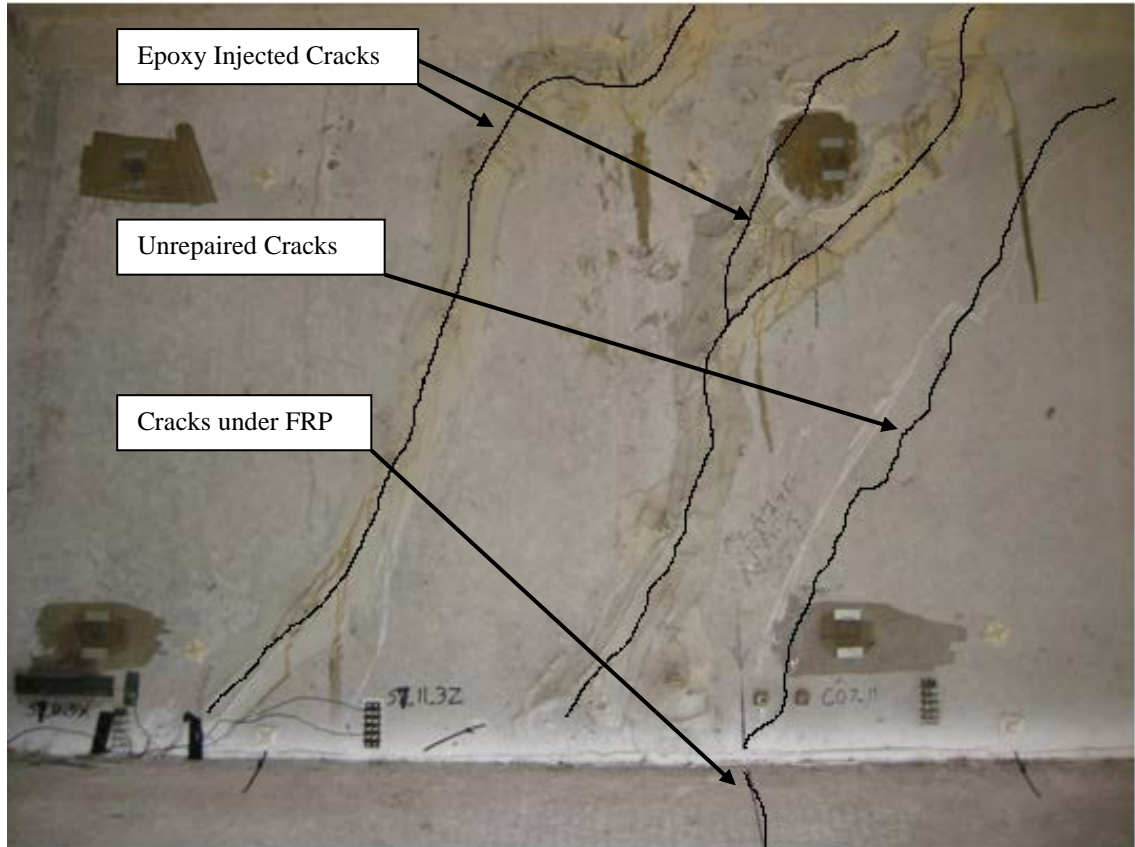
Cracks in east face of Span 11 Girder 7
